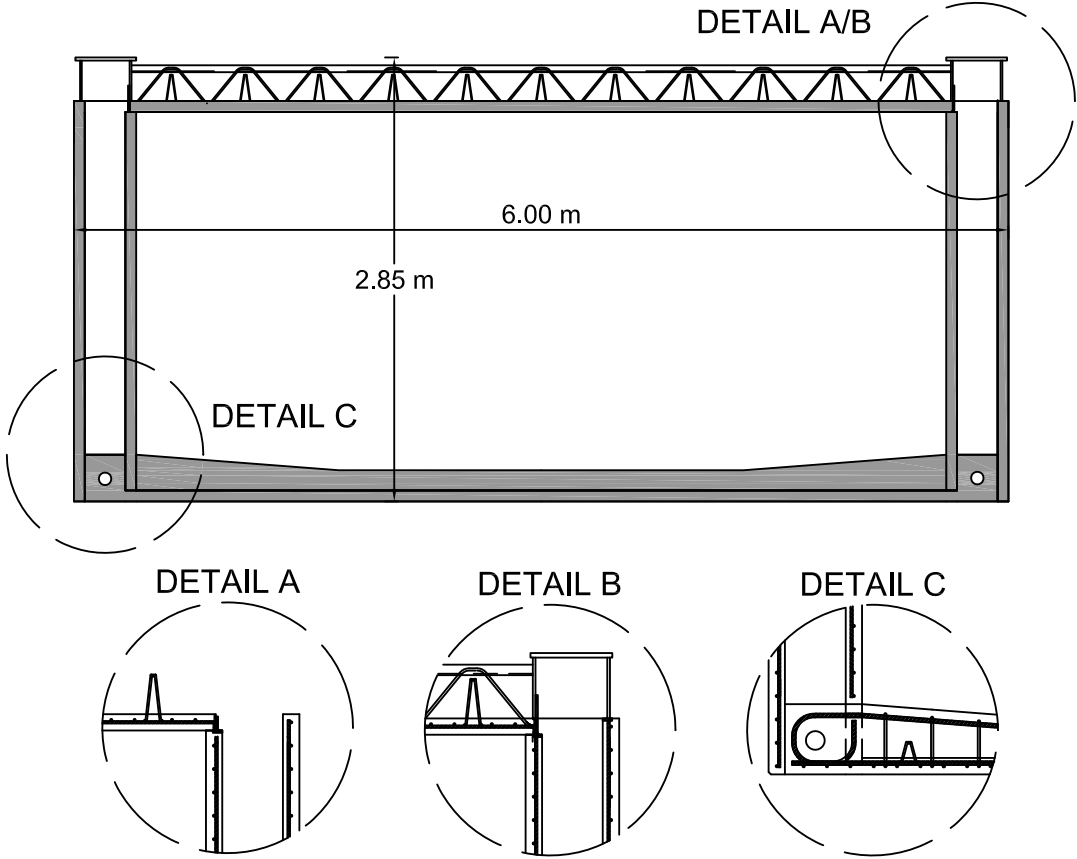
Prototype cross-section with Details A through C showing the connections between webs and slabs of the cross-section
